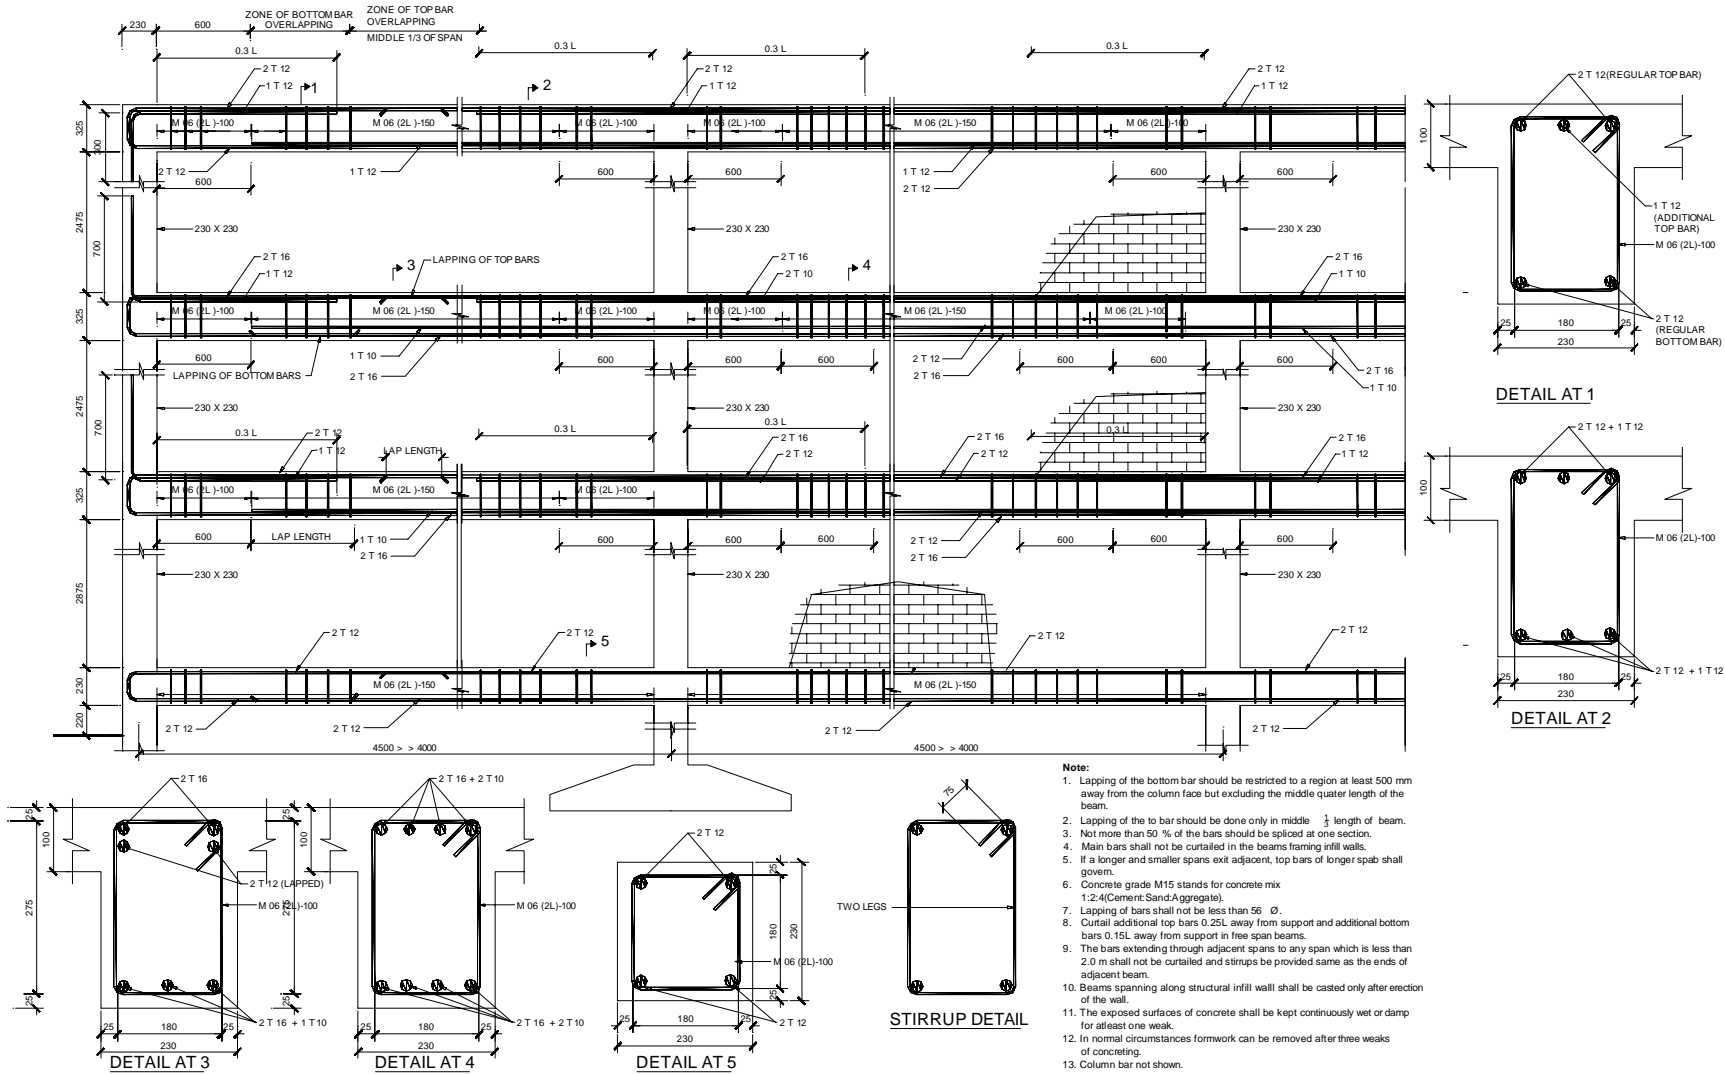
Beam Detail (two walls each way / 100 m²)
